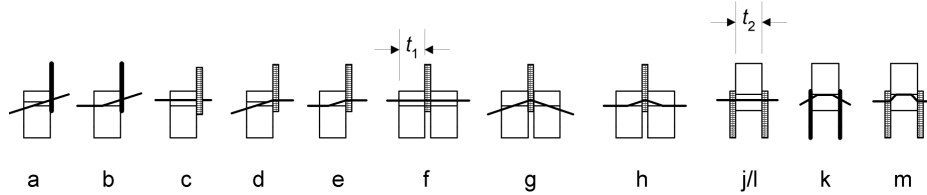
Timber-to-steel connections failure modes.
